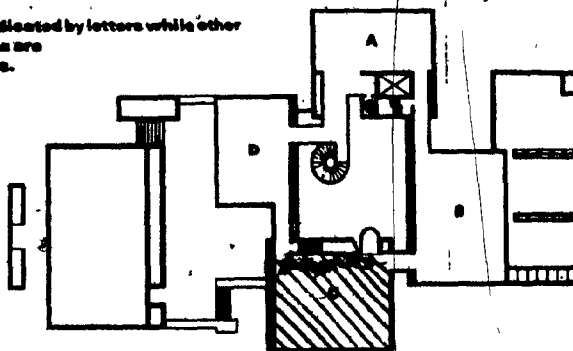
, Second floor plan, gallery (C) is shaded.
